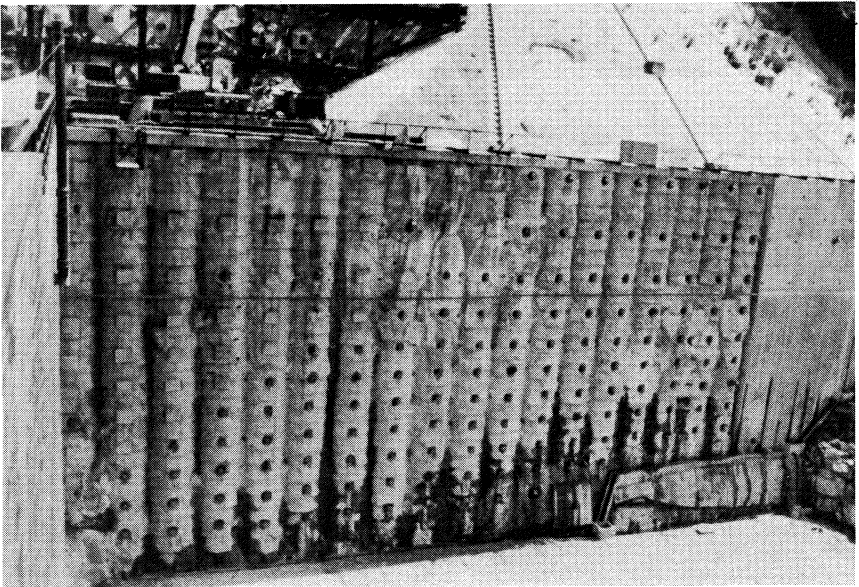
Hand-Dug Caisson Wall with Temporary Ground Anchors.
